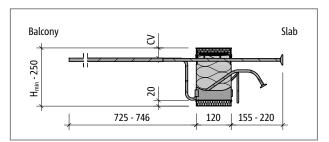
Schöck Isokorb® XT type K-U-M4: Product section
